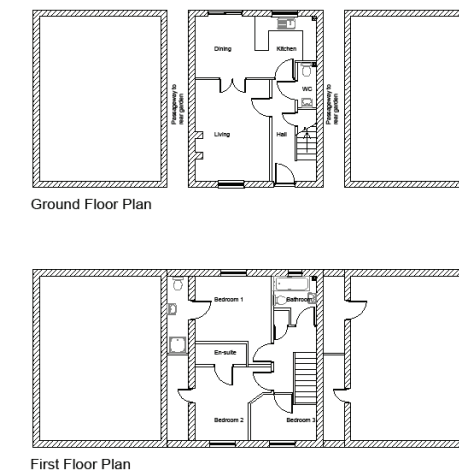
Use of Double Party Walls in Terraces, to give access to rear garden and improve sound insulation between houses
